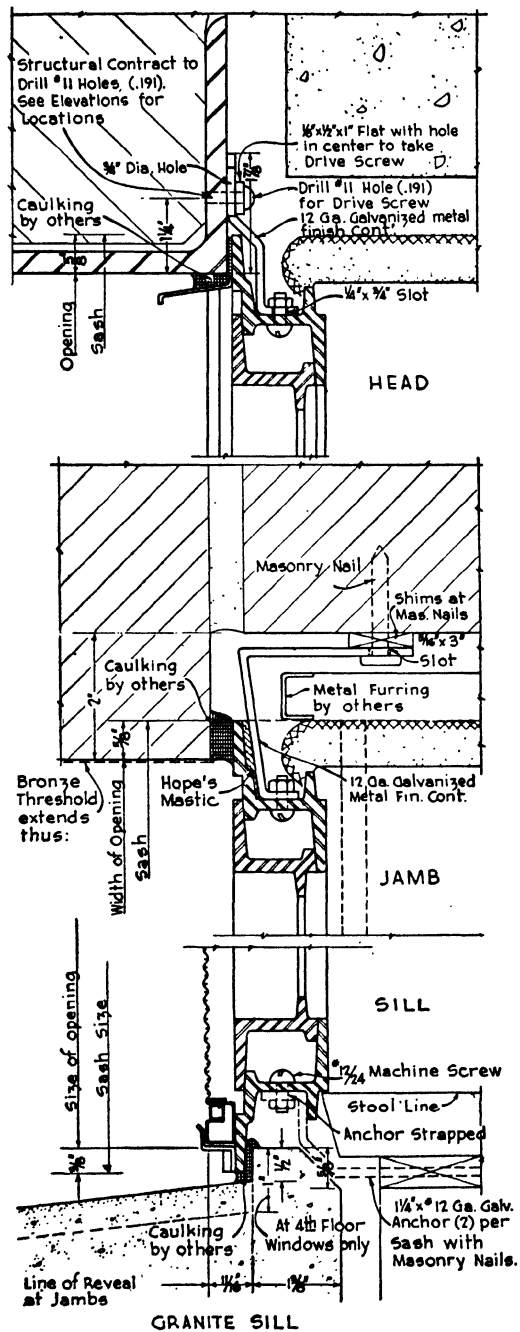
Details for Fastening Steel Sash in Masonry Walls.
